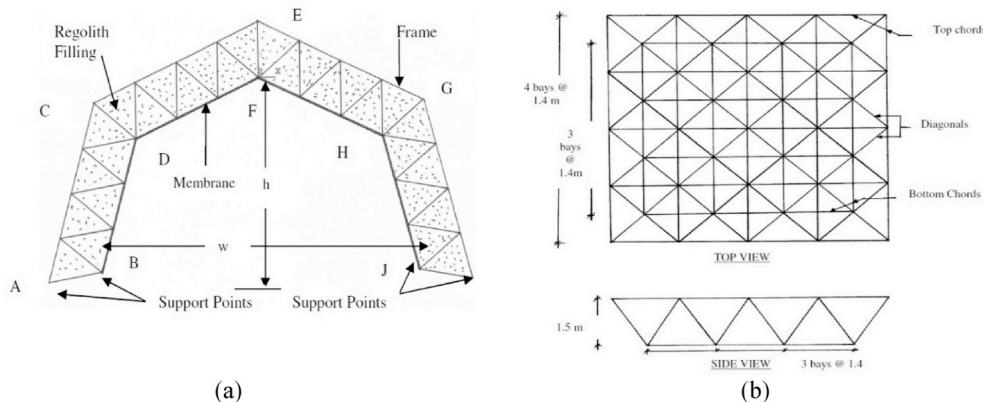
Proposed structure: a) Elevation; b) Plan and side views, Malla & Chaudhuri [137].
